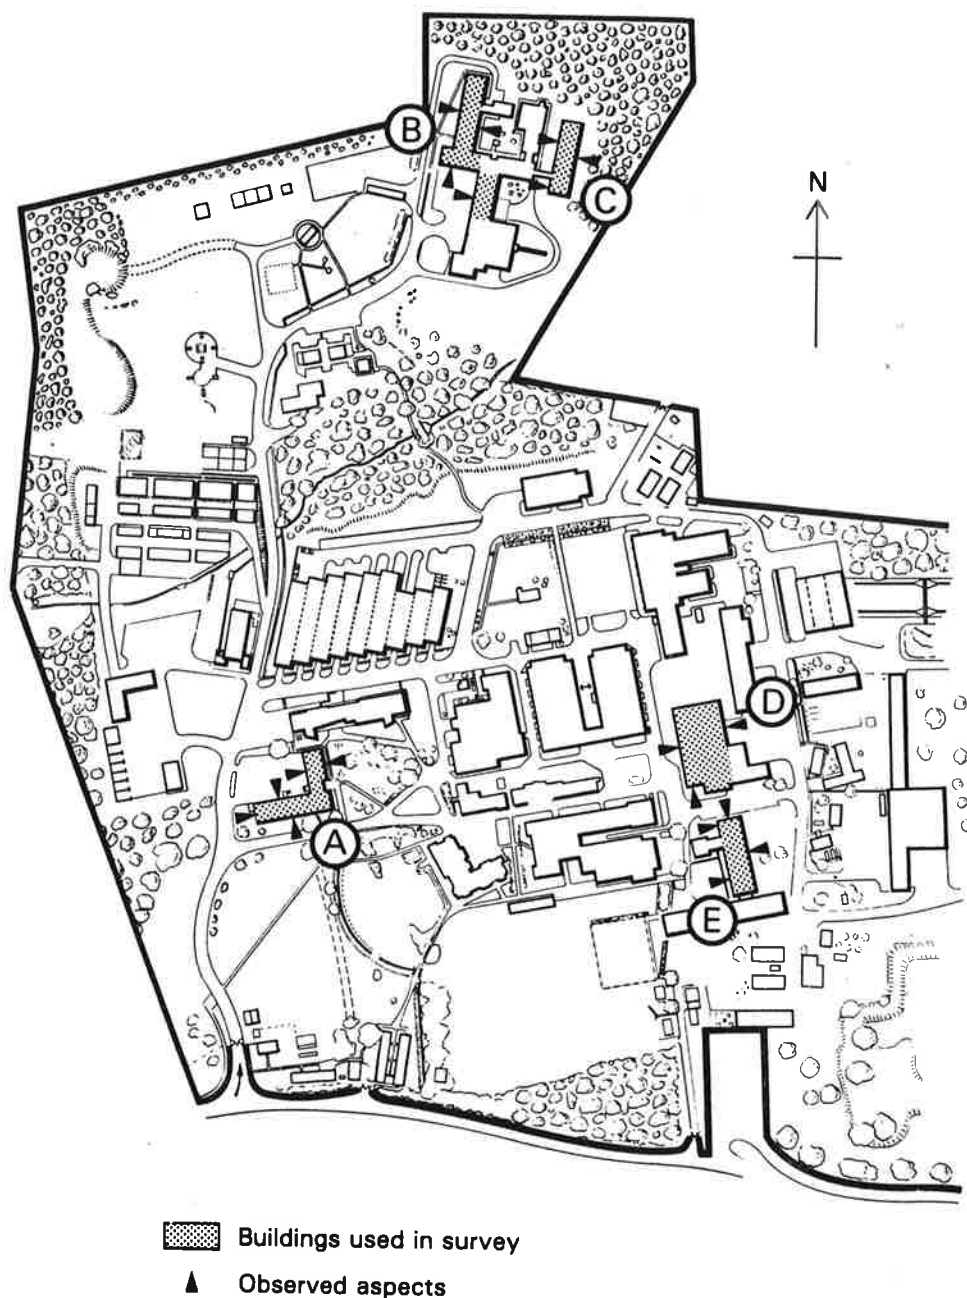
Site plan showing the location and orientation of the five office buildings.
